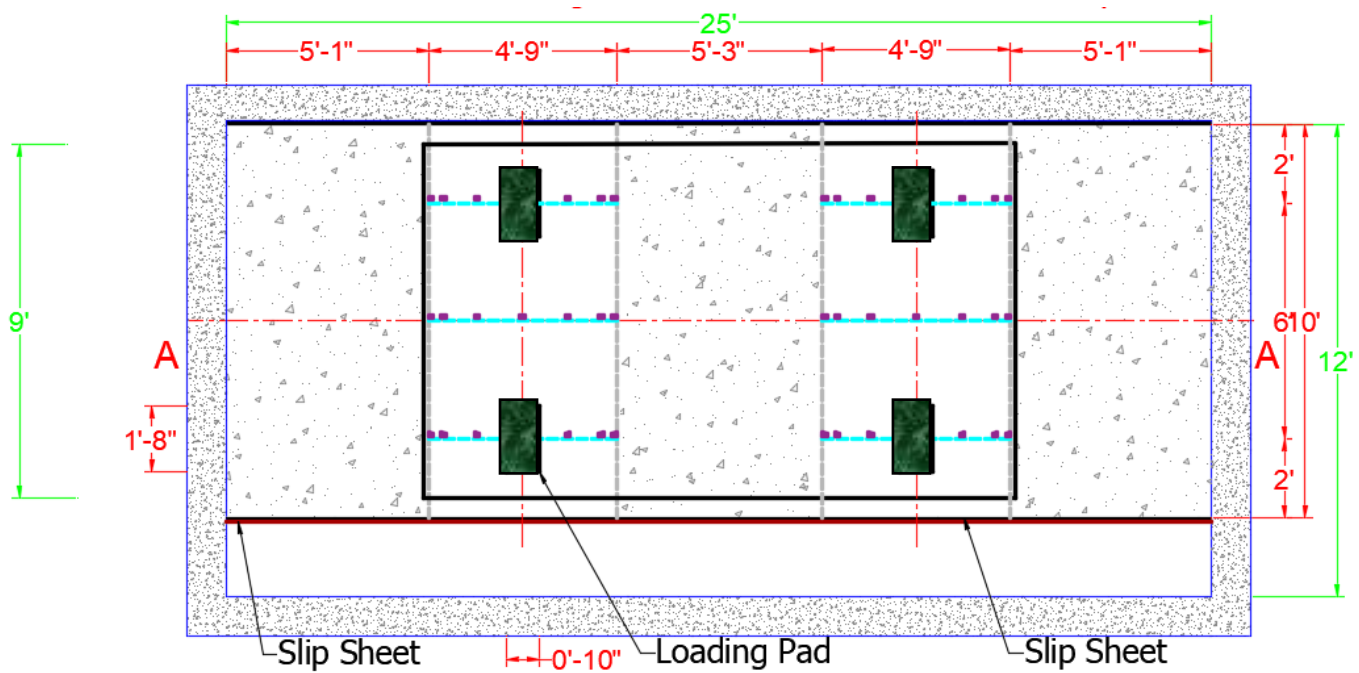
Soil Box Test Plan View (Pipe Arch Shapes)
